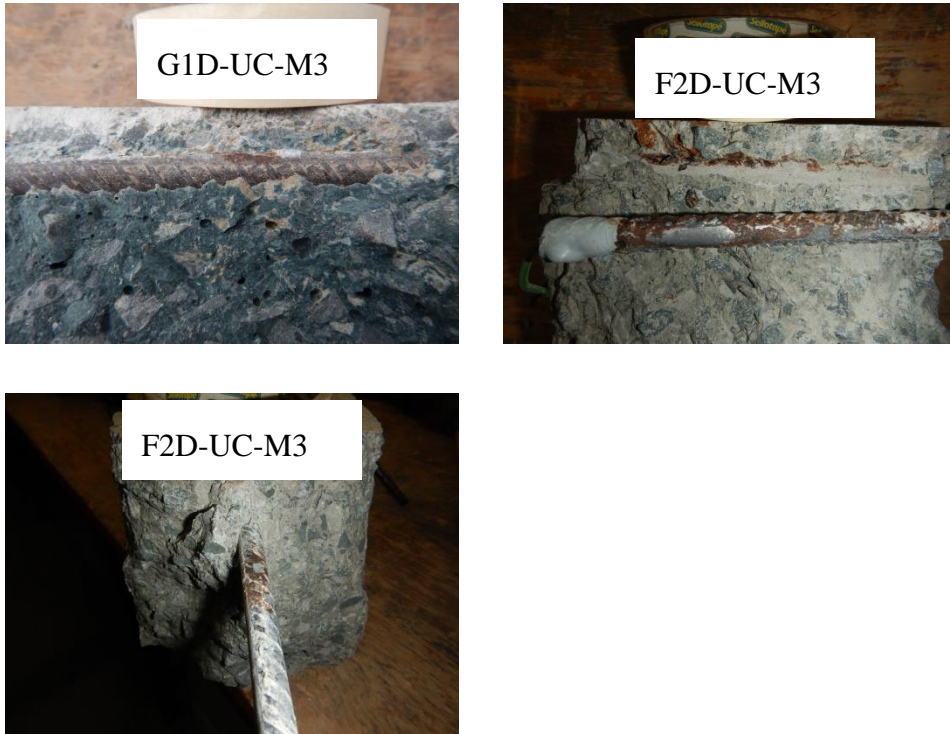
Photographs of corroded reinforcement bars in uncracked concrete
